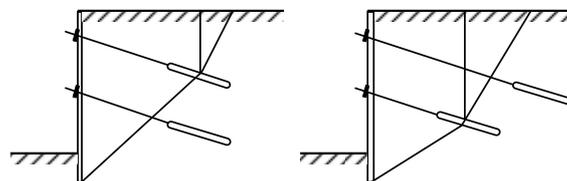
Consideration of anchors outside and inside of the failure zone (EAB 2008)
